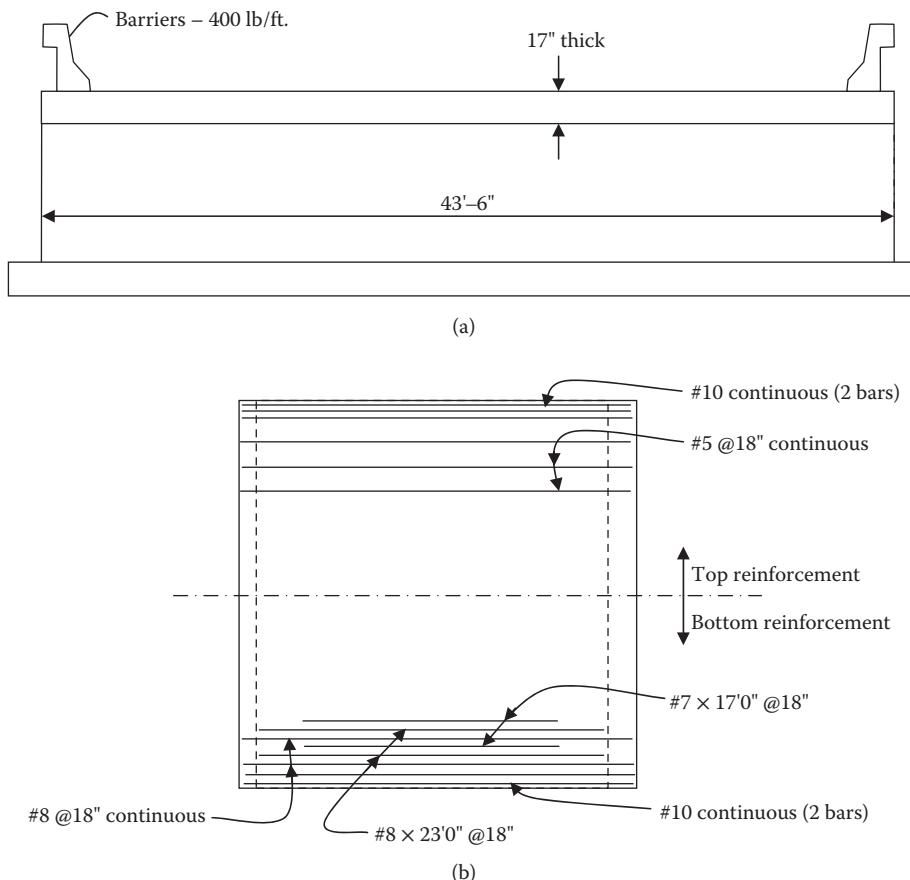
Details of single-span RC slab bridge example: (a) Typical section and (b) reinforcement layout of 43.5-ft.-wide single-span (23.5 ft.) RC slab.
